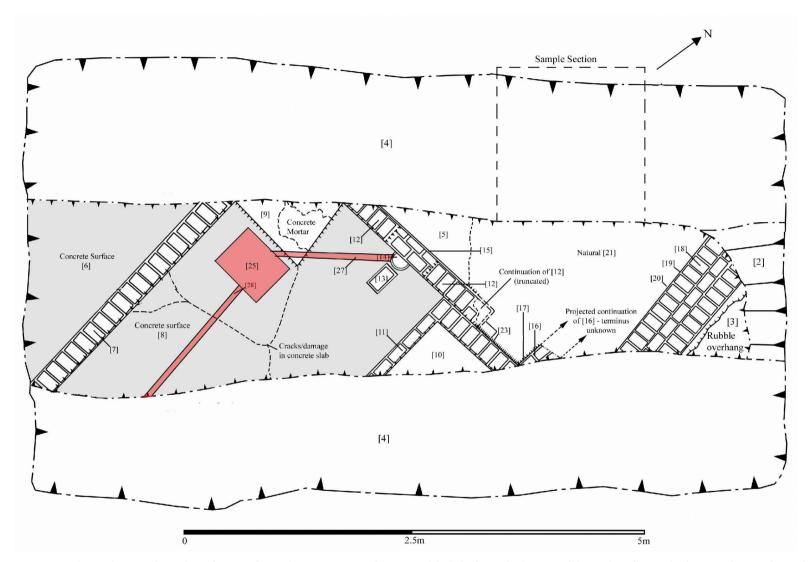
Plan of Trench 1 showing series of concrete surfaces and brick foundations, with under-floor drainage shown in red.
